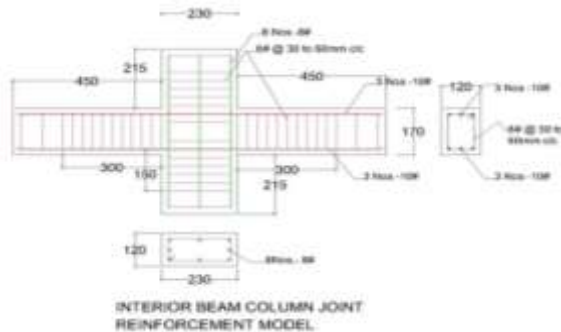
Reinforcement detail of Interior beam-column joint as per IS 13920
